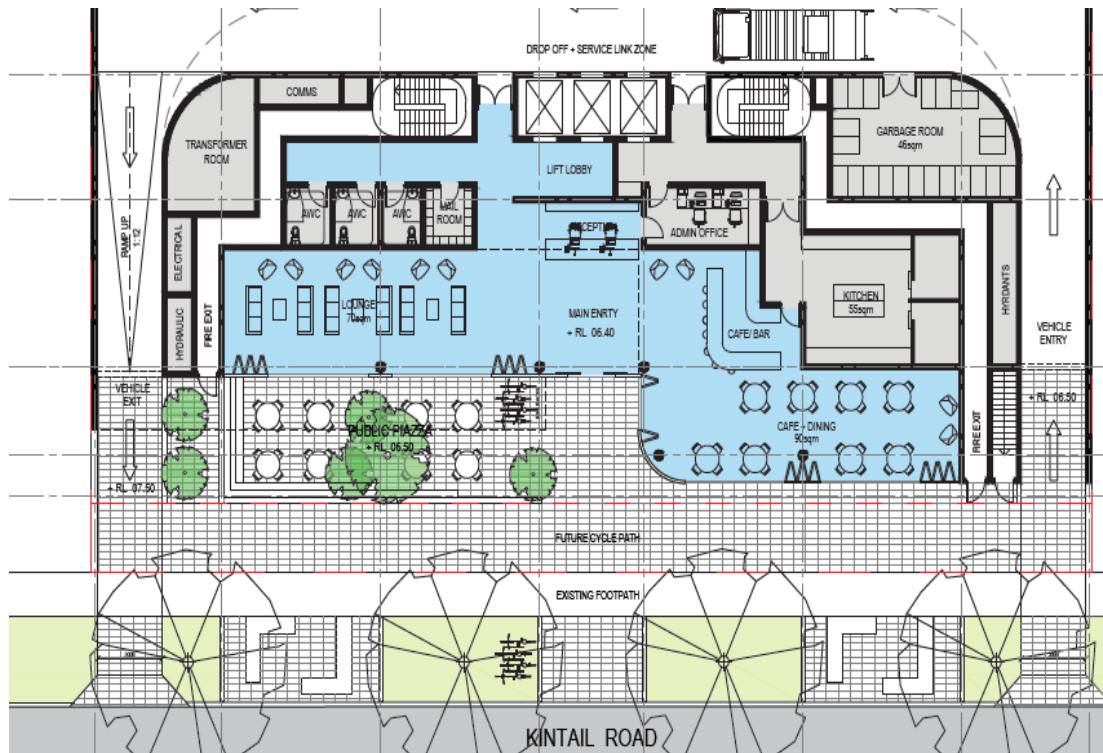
Original ground floor plan presented at April Canning Bridge Design Review Panel Meeting
